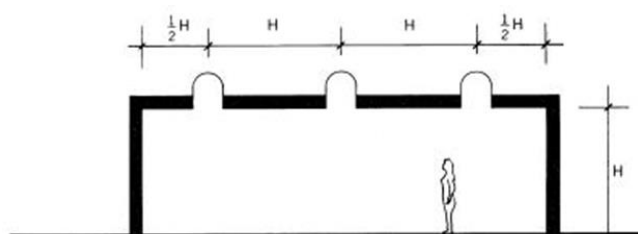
Recommended spacing for skylights without windows as a function of ceiling height (Source: Lechner 2009)
